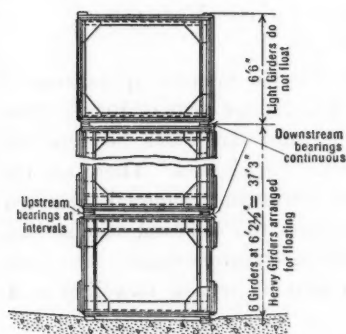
VERTICAL SECTION THROUGH STOP-LOG GIRDERS, SECTION E-E OF FIG. 7.
